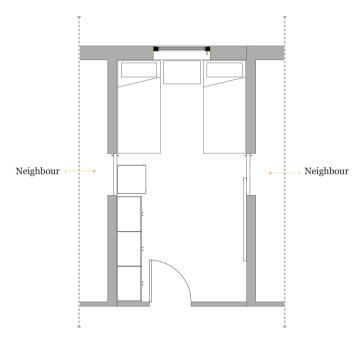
Single Man - Room Appropriations - Floor Plan - Scale (1:100) Source: Author
